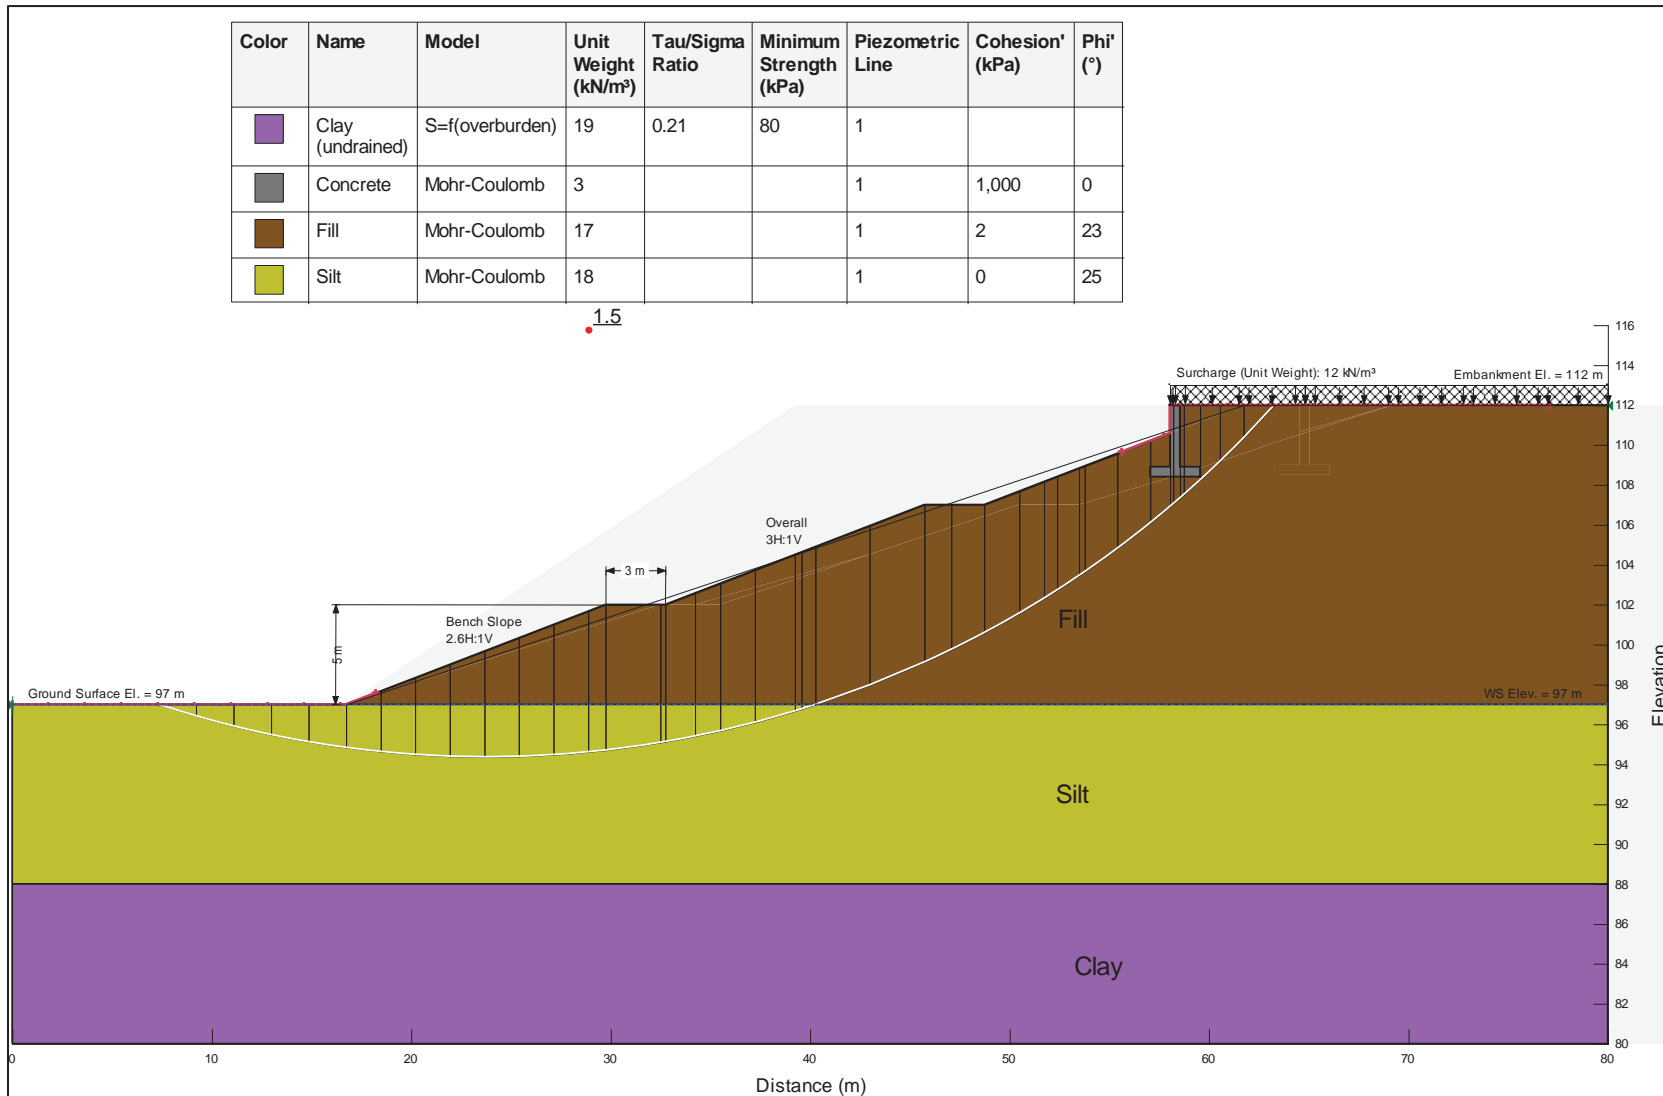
Jane St. South Embankment End of Construction (Undrained) Case A1
